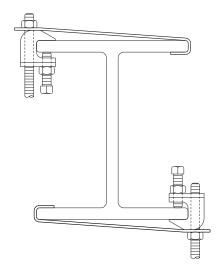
R - Retrofit Capable Beam Clamp Retaining Strap
